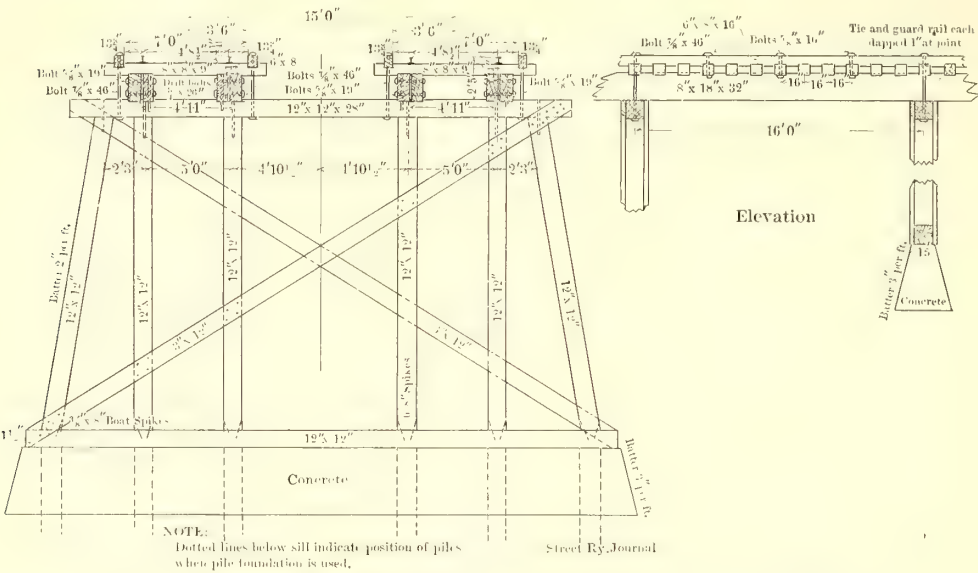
CONSTRUCTION AND DETAILS OF STANDARD TRESTLE
